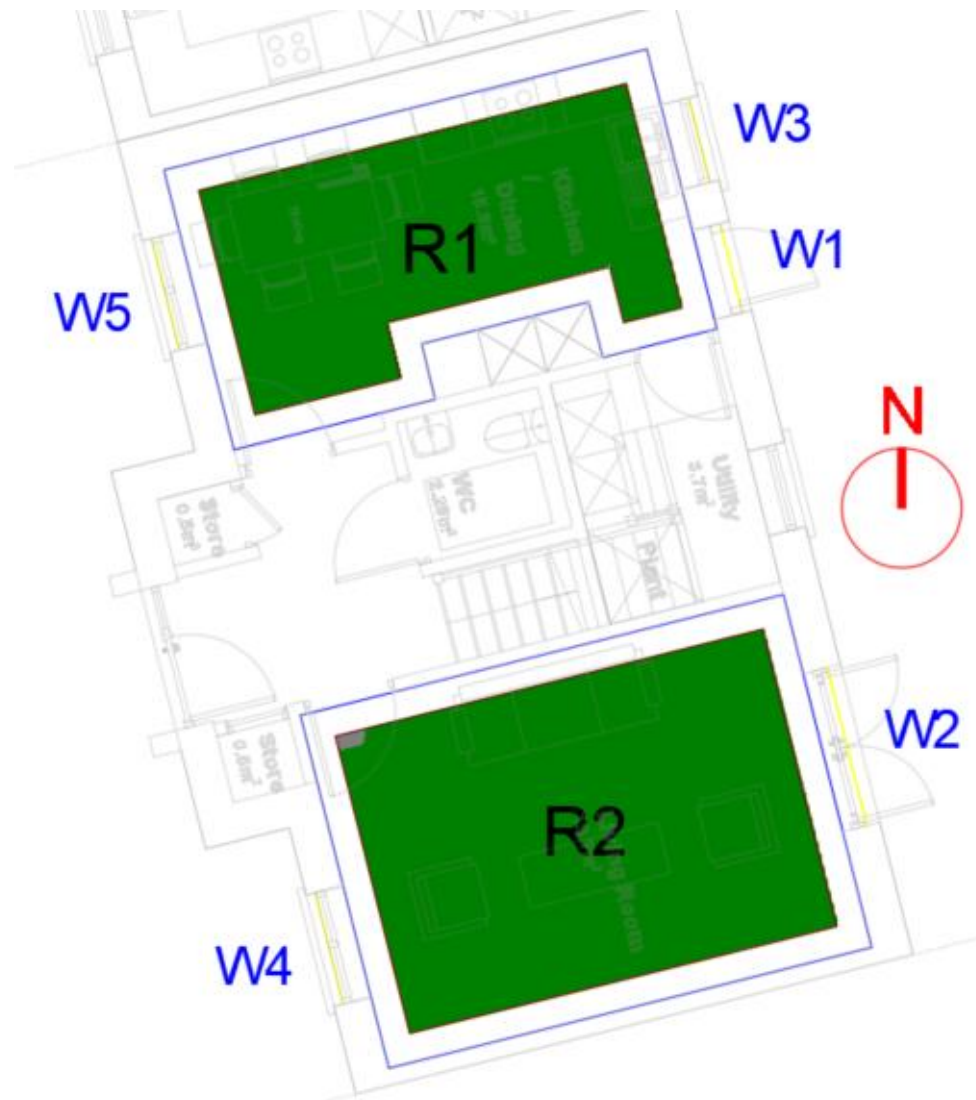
Proposed Ground Floor sDA Contours of House F-02 2-001
